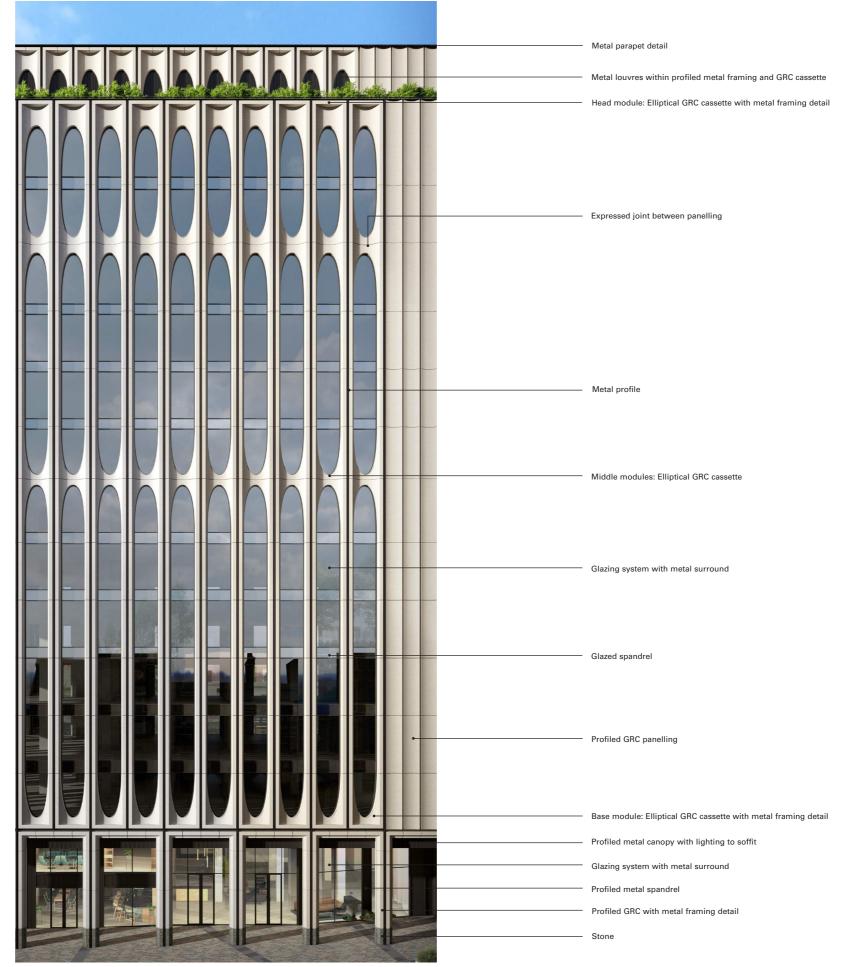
Newcombe House - Proposed Illustrative Bay Study
